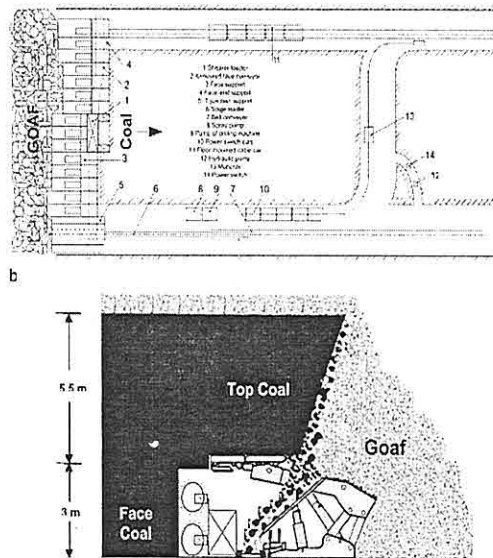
Plan (a), cross-sectional (b) view of the longwall (Destanoğlu et al, 2000).
